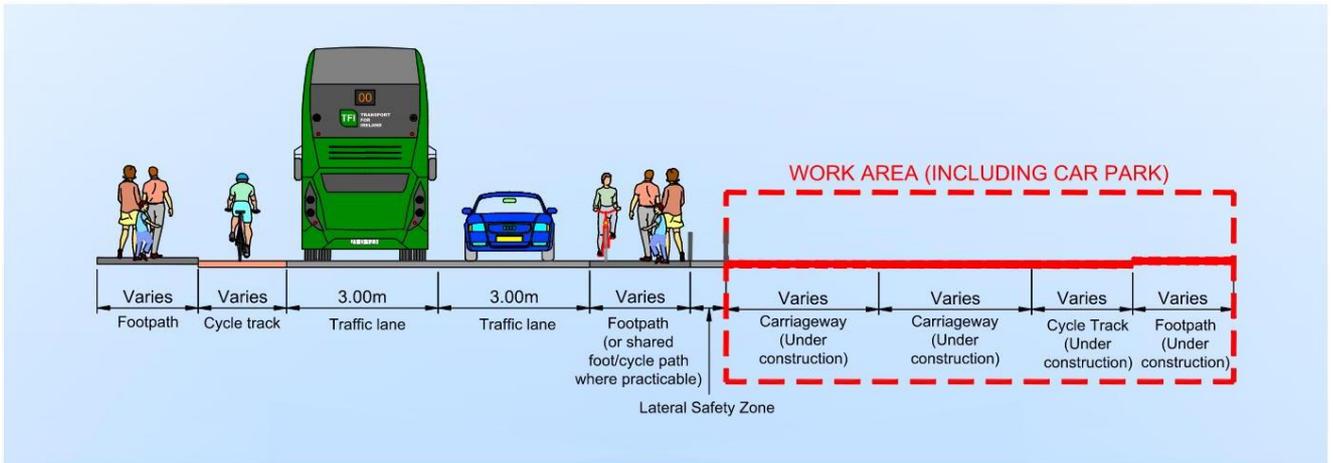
Traffic Management Cross Section, Section 7b – Stage 1
